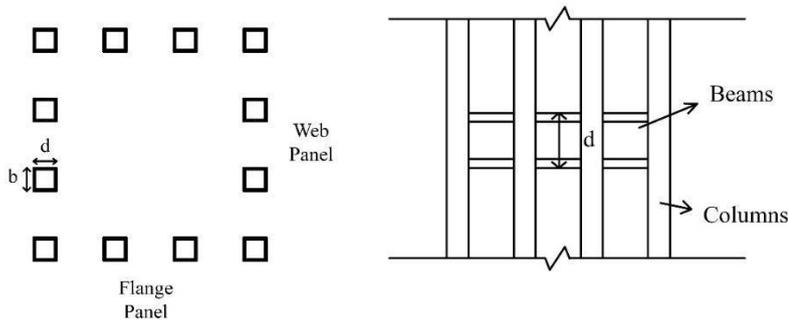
Tubular frame plan and side view for defining "b" and "d"
